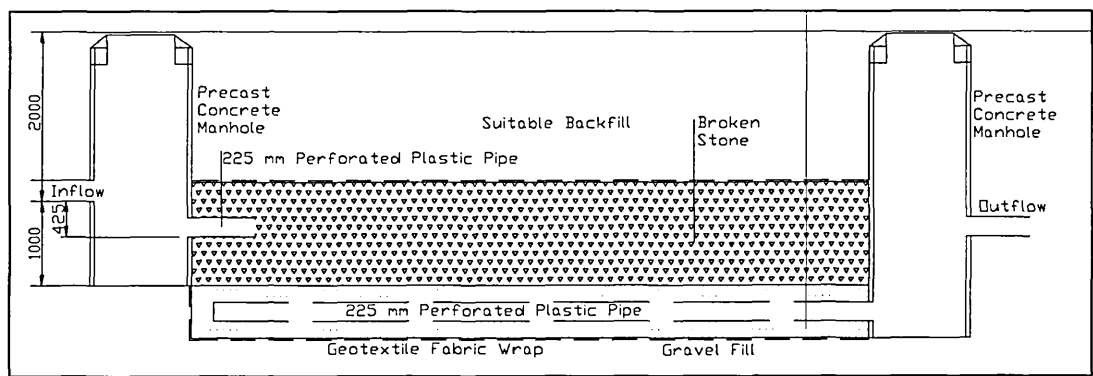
Long section of typical infiltration trench, e.g. Walker Dam
